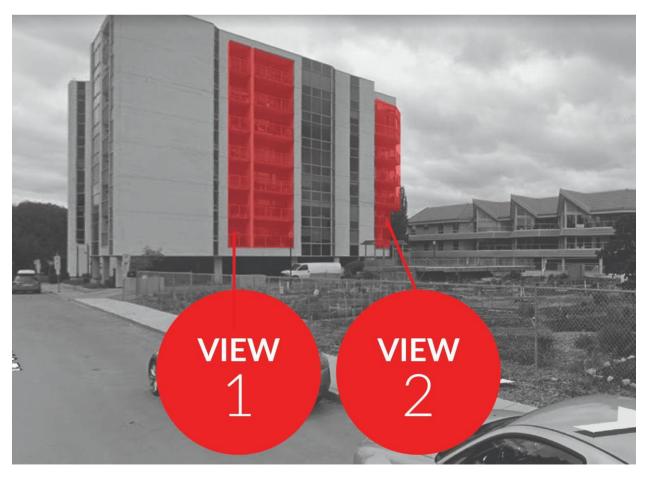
ILLUSTRATION OF NEIGHOURING BUILDING WINDOW VIEWS IMPACTED BY A BUILDING ON 509 12TH STREET.
